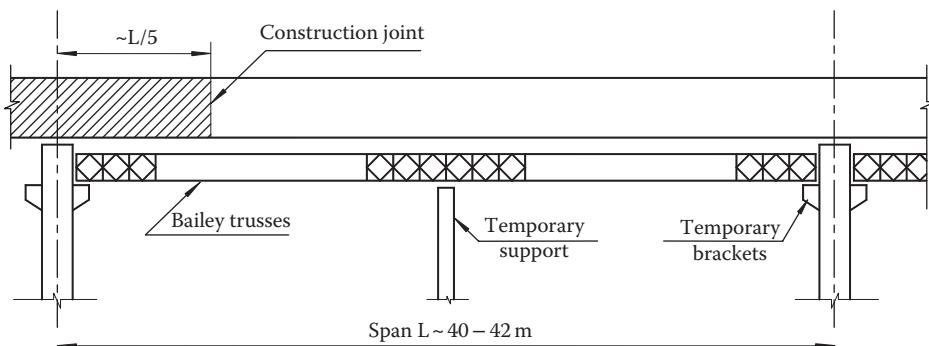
Bailey trusses supported on brackets installed to columns or piers.
